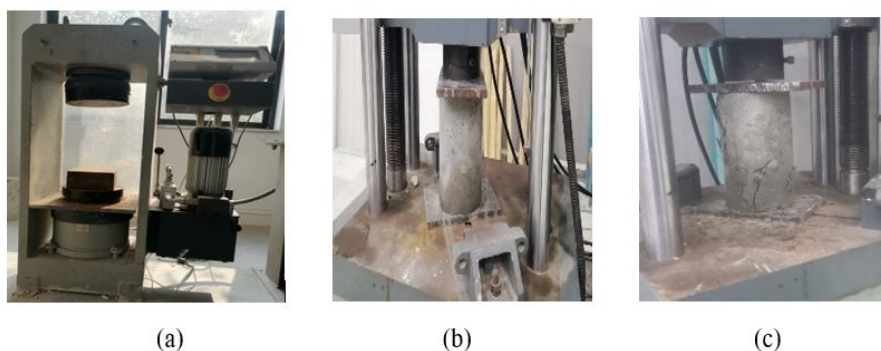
Experimental setup (a) Compression Testing Machine (b) sample before testing & (c) sample after testing
